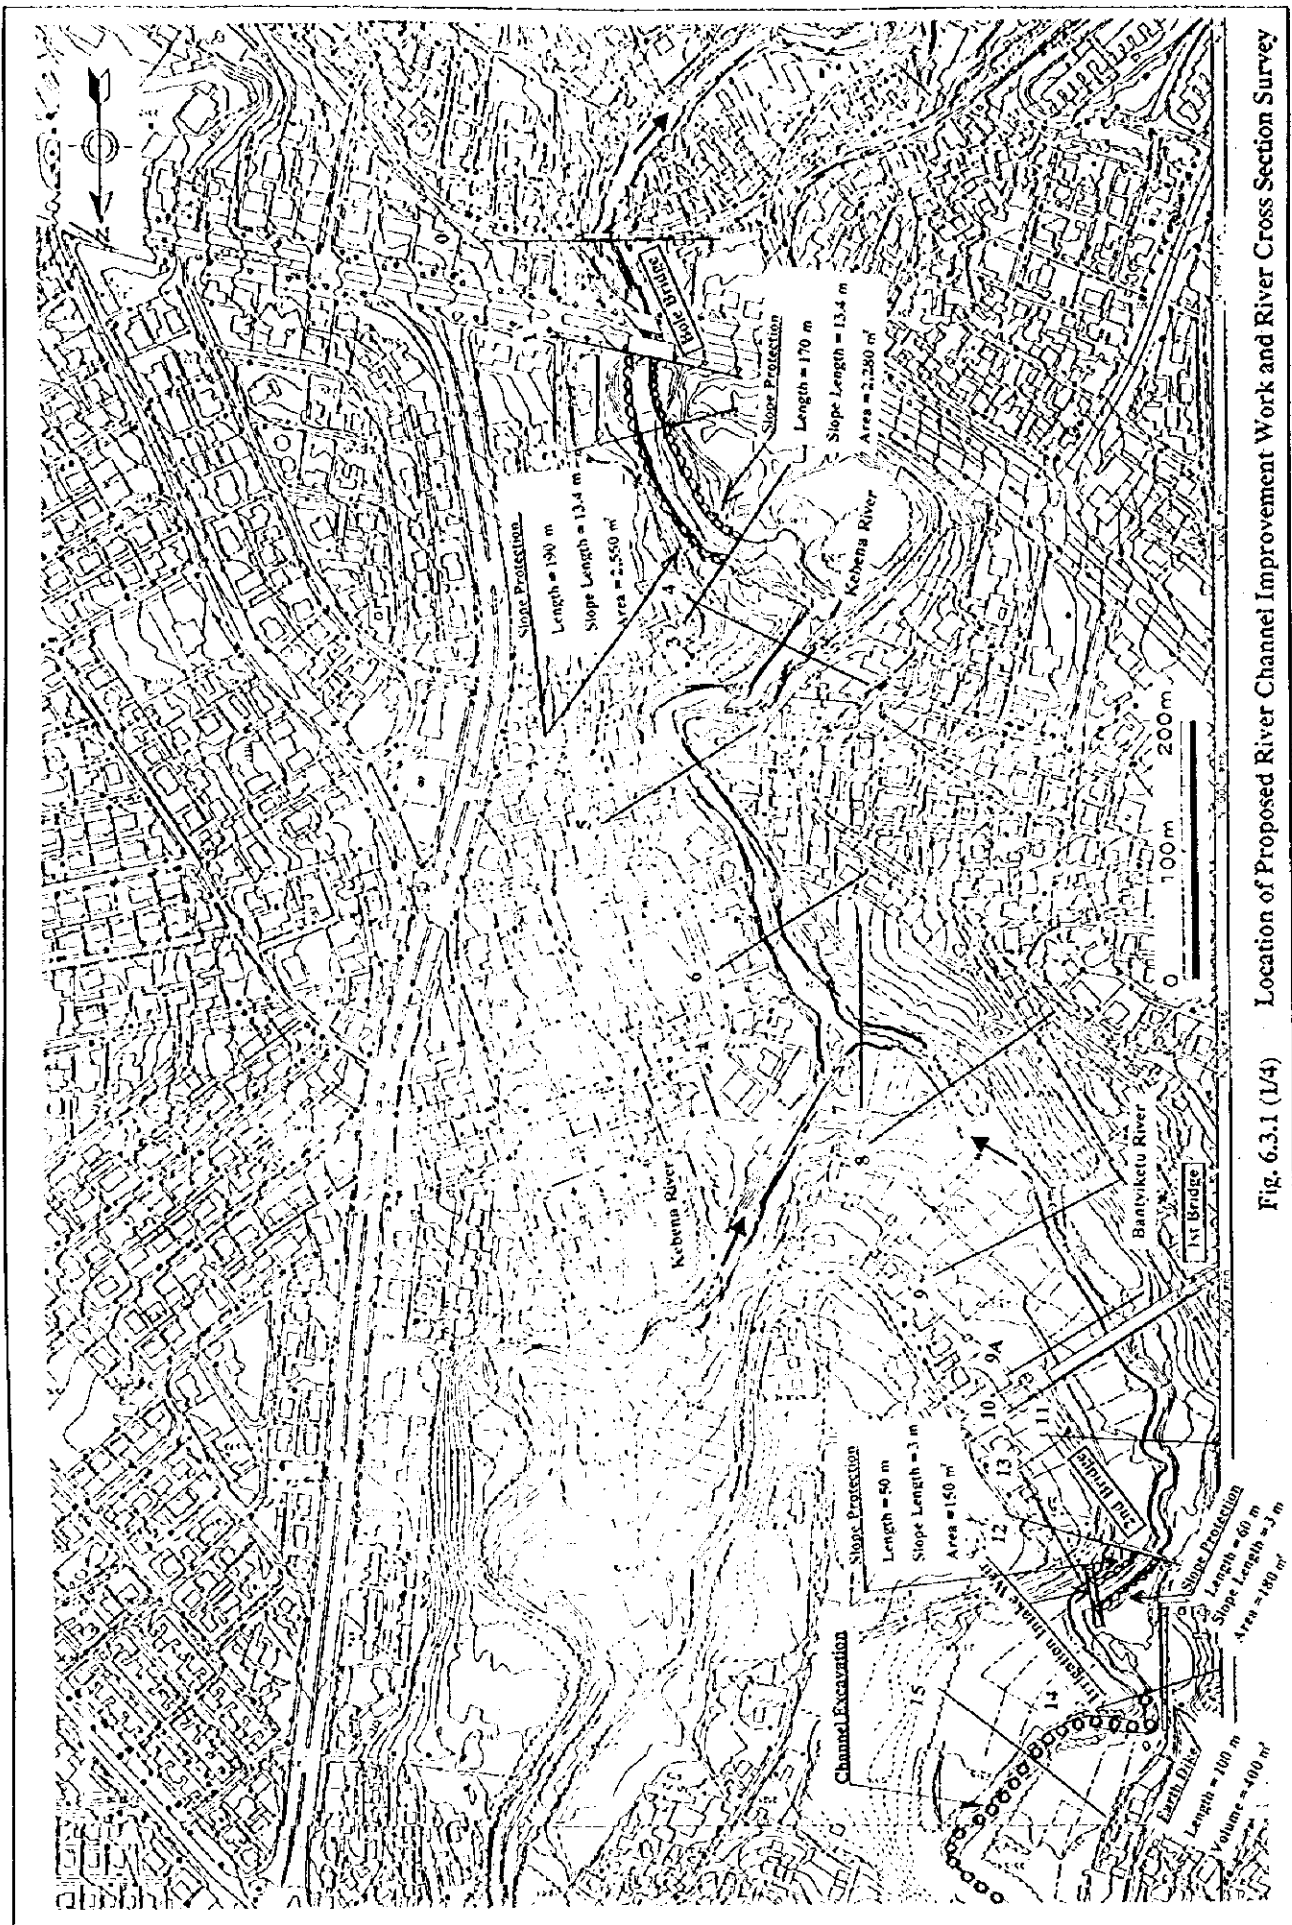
(1/4) Location of Proposed River Channel Improvement Work and River Cross Section Survey
